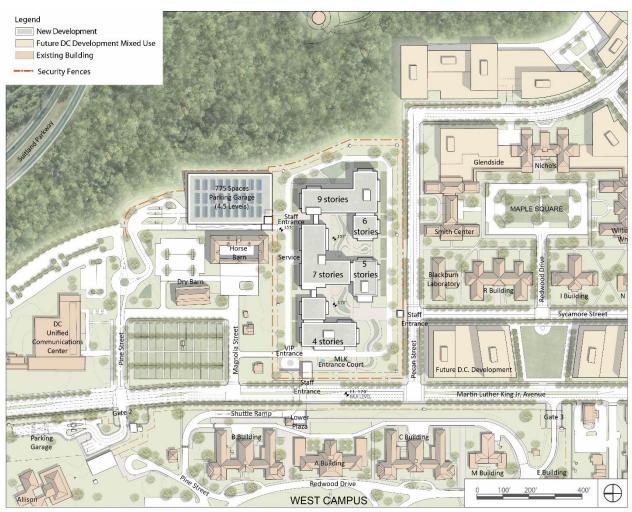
2012 Master Plan Amendment, showing the proposed FEMA Headquarters site layout on the federal use parcel (StE-2)
